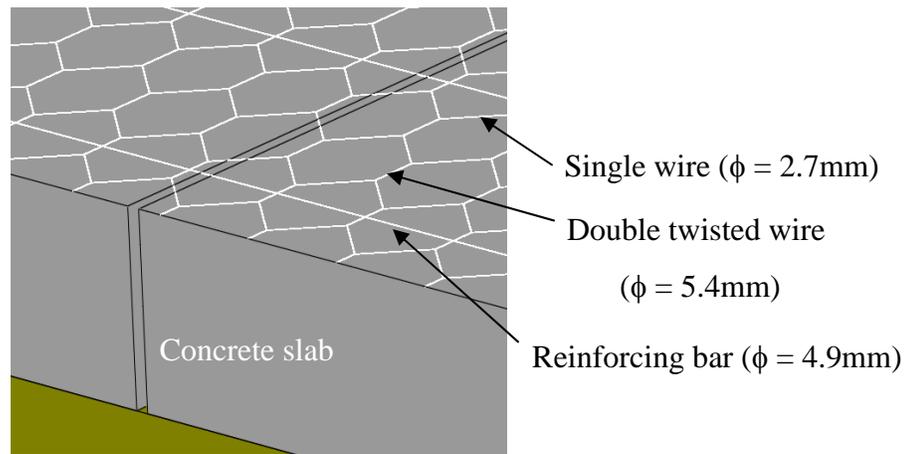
Steel reinforcement netting configuration and placement on the concrete slab.
